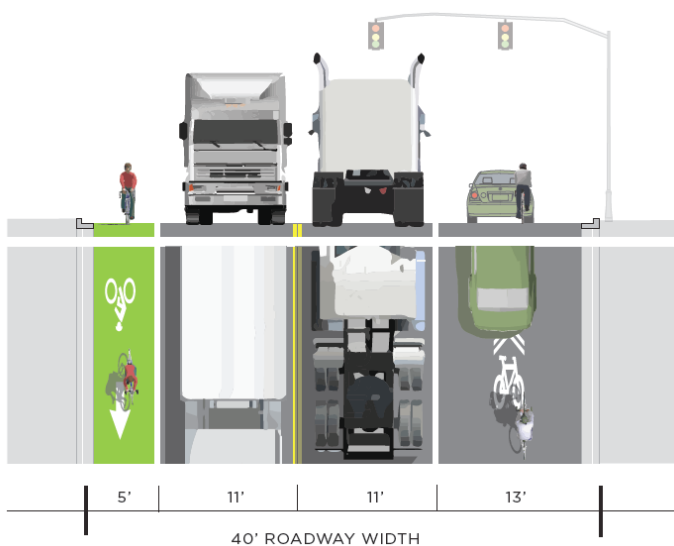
Vernon Avenue at Soto Street (Eastbound)
